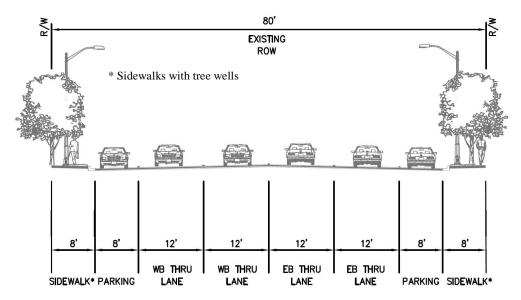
Proposed Cross Section, E Street Between 3rd Avenue and Broadway
